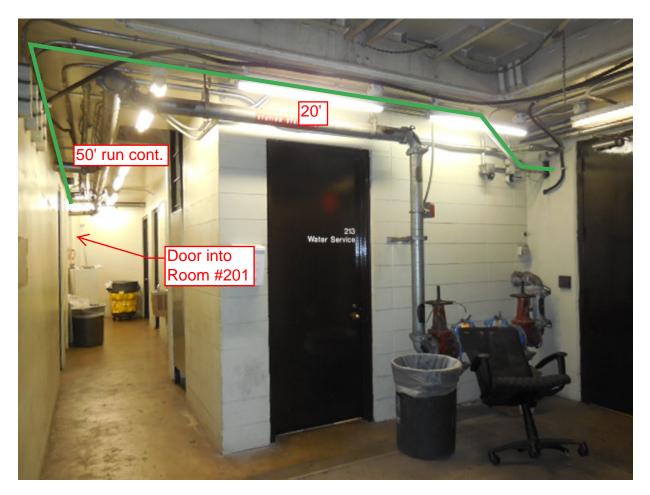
A03 Dupont Circle South: Proposed conduit run continuing down hallway of room #201 and towards room #215
